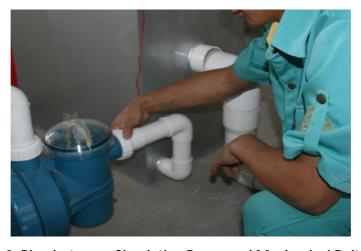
Pipe between Circulating Pump and Mechanical Belt Filter.
